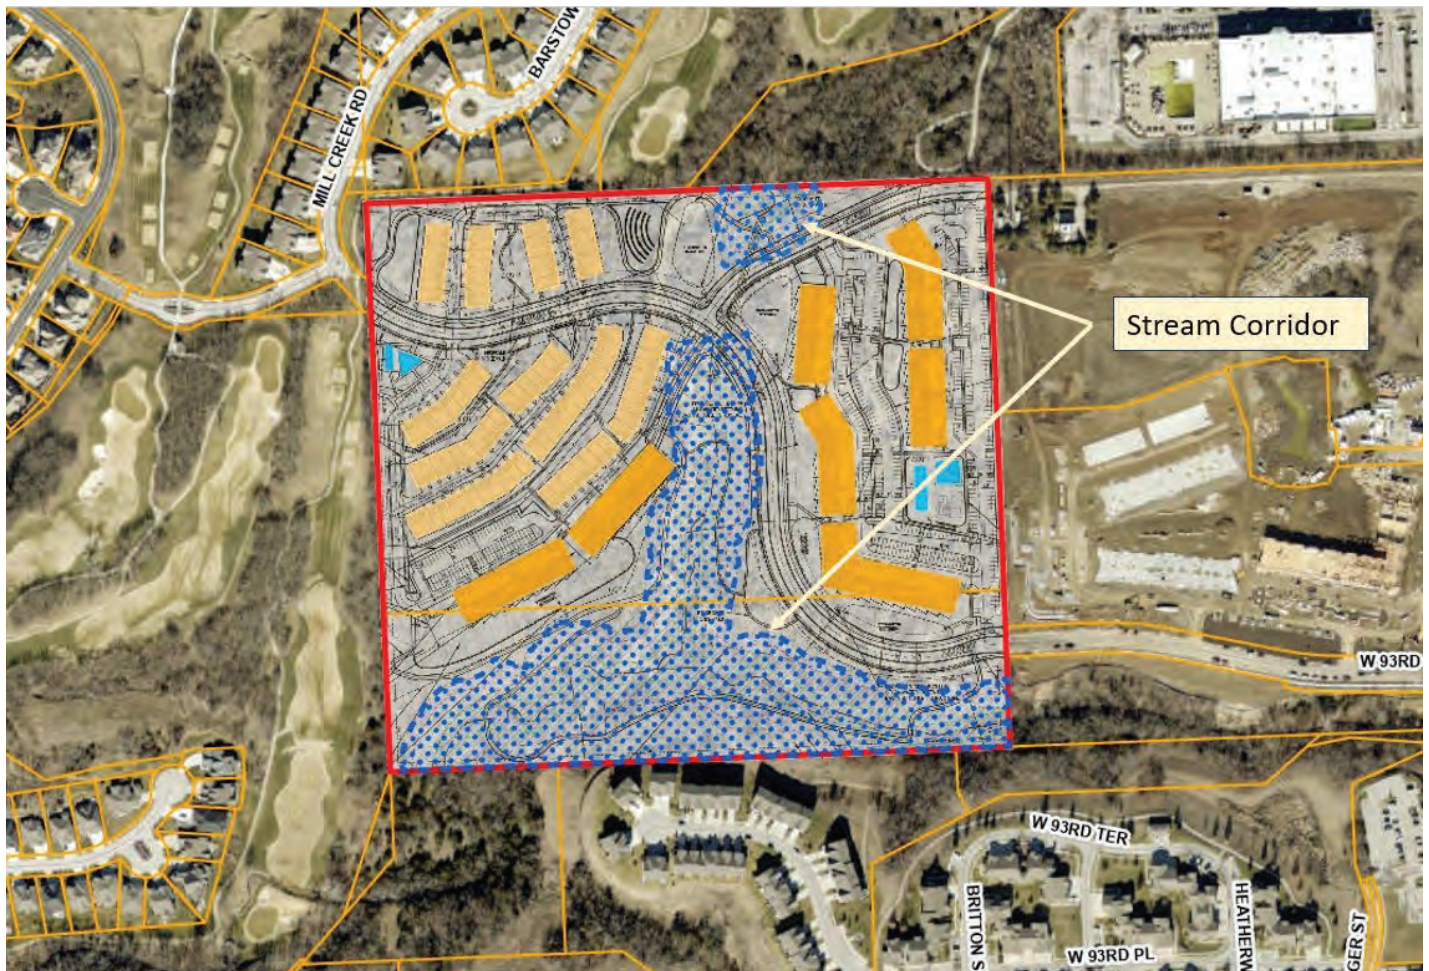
REVISED SUBMITTAL Site Plan.
